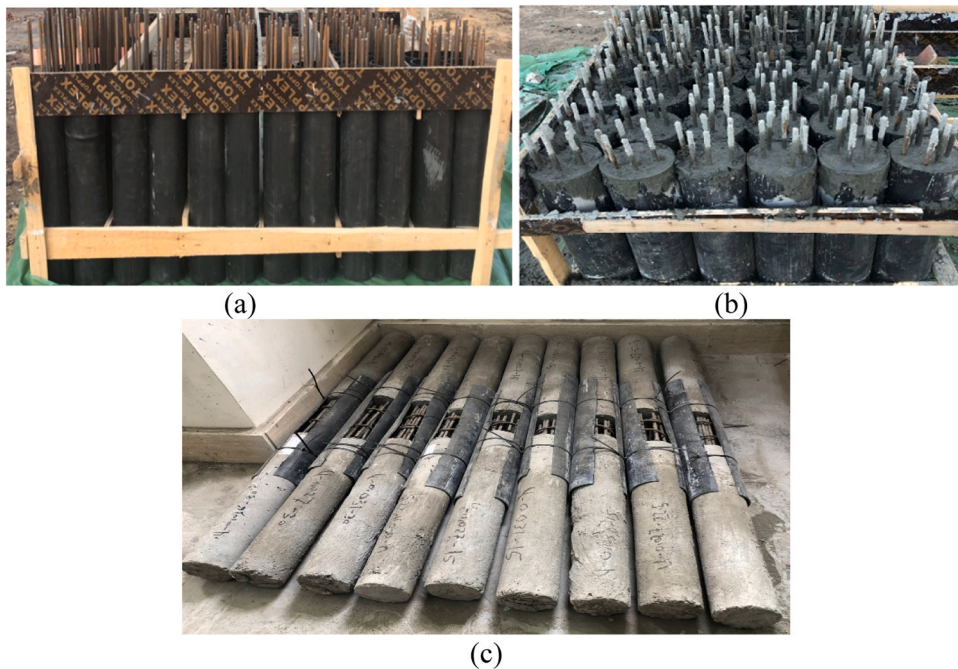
Casting of specimens and preparation: (a) the formwork; (b) after casting; and (c) connecting the specimens.
